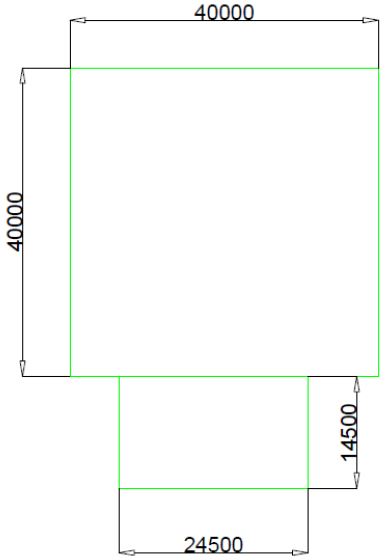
Dimensioned sketch of the Climaespaço's main building rooftop
